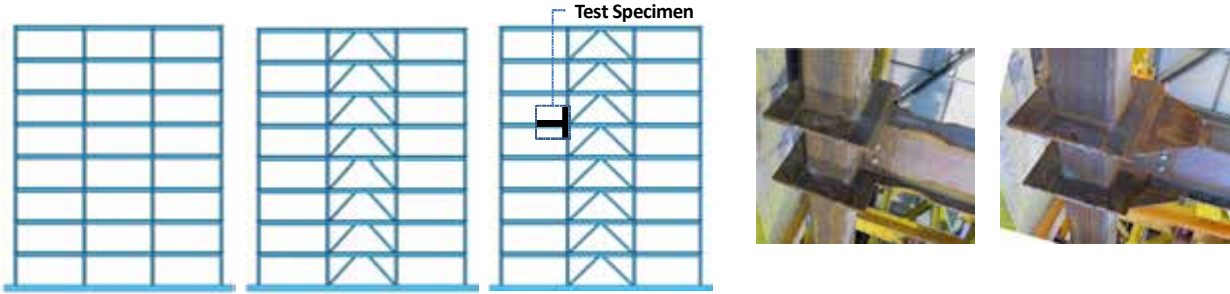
Figure II. Design of dual-steel multi-storey frames (MRF, D-EBF, D-CBF), choice of members (beams, columns) and design of beam-to-column joint specimens
